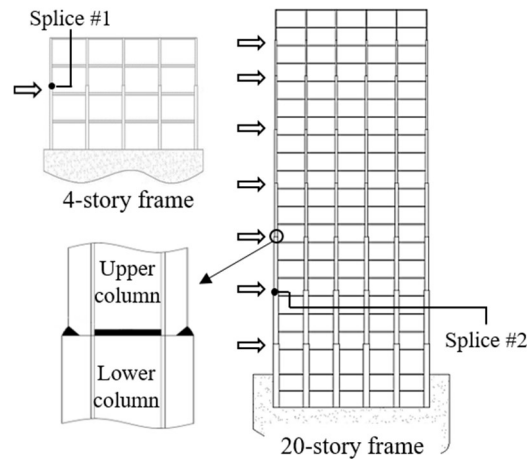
Schematic illustration of 4- and 20-story steel frame models and welded column splice
